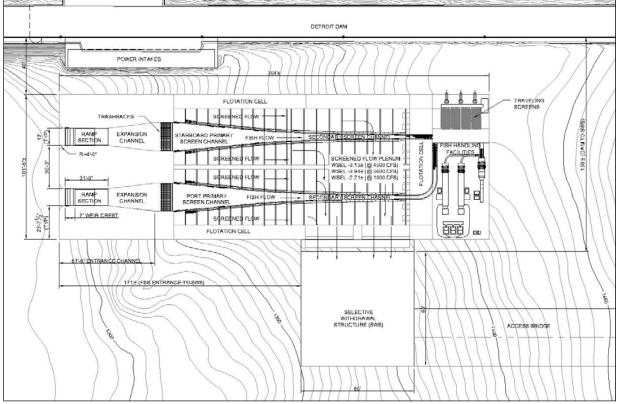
Plan View of the FSS and SWS (upper deck not shown for support clarity)
